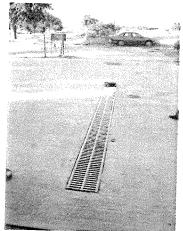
Facing south of the maintenance building: Trench drain followed by the cleanout and gravel (gravel pit)
